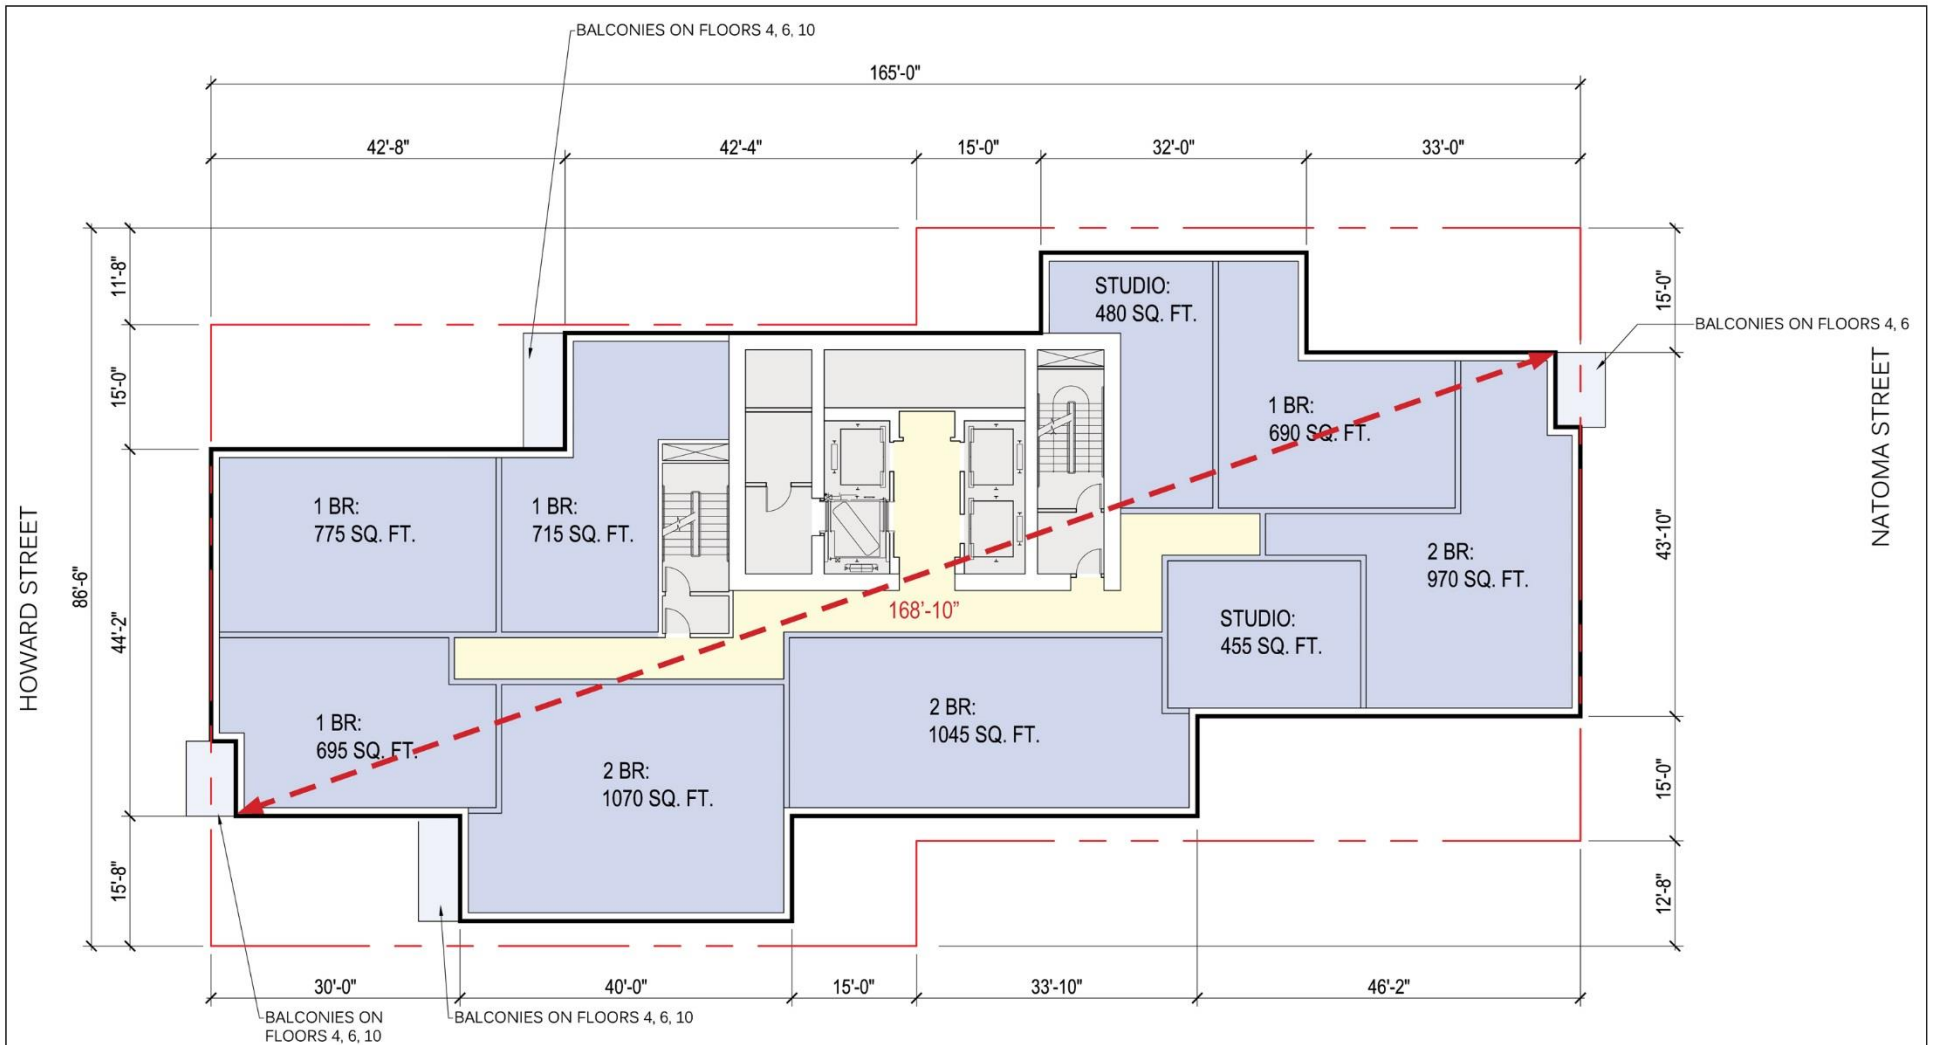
Conceptual Residential Floor Plan (Floor 2)
